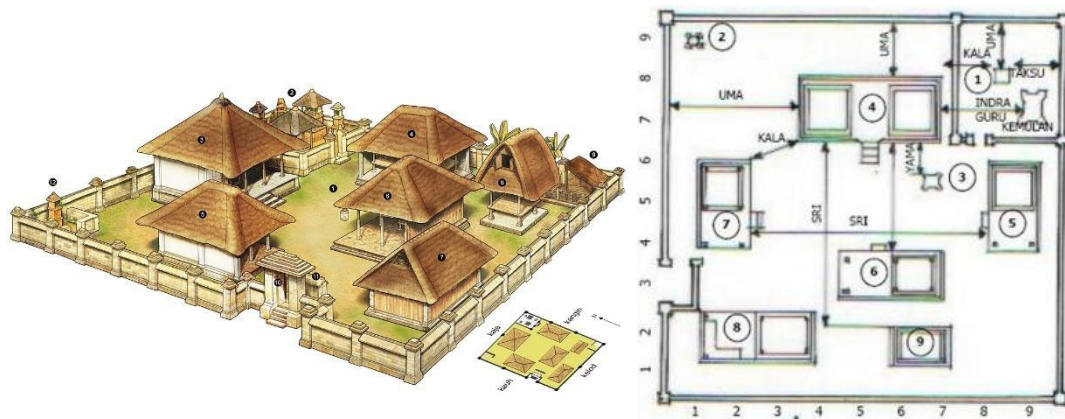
Illustration of a Balinese traditional house (left) and the layout (right)
